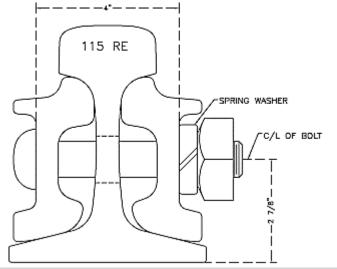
Figure SUB-PART D - 57 - Clearance Joint Bar Assembly for 115 RE
